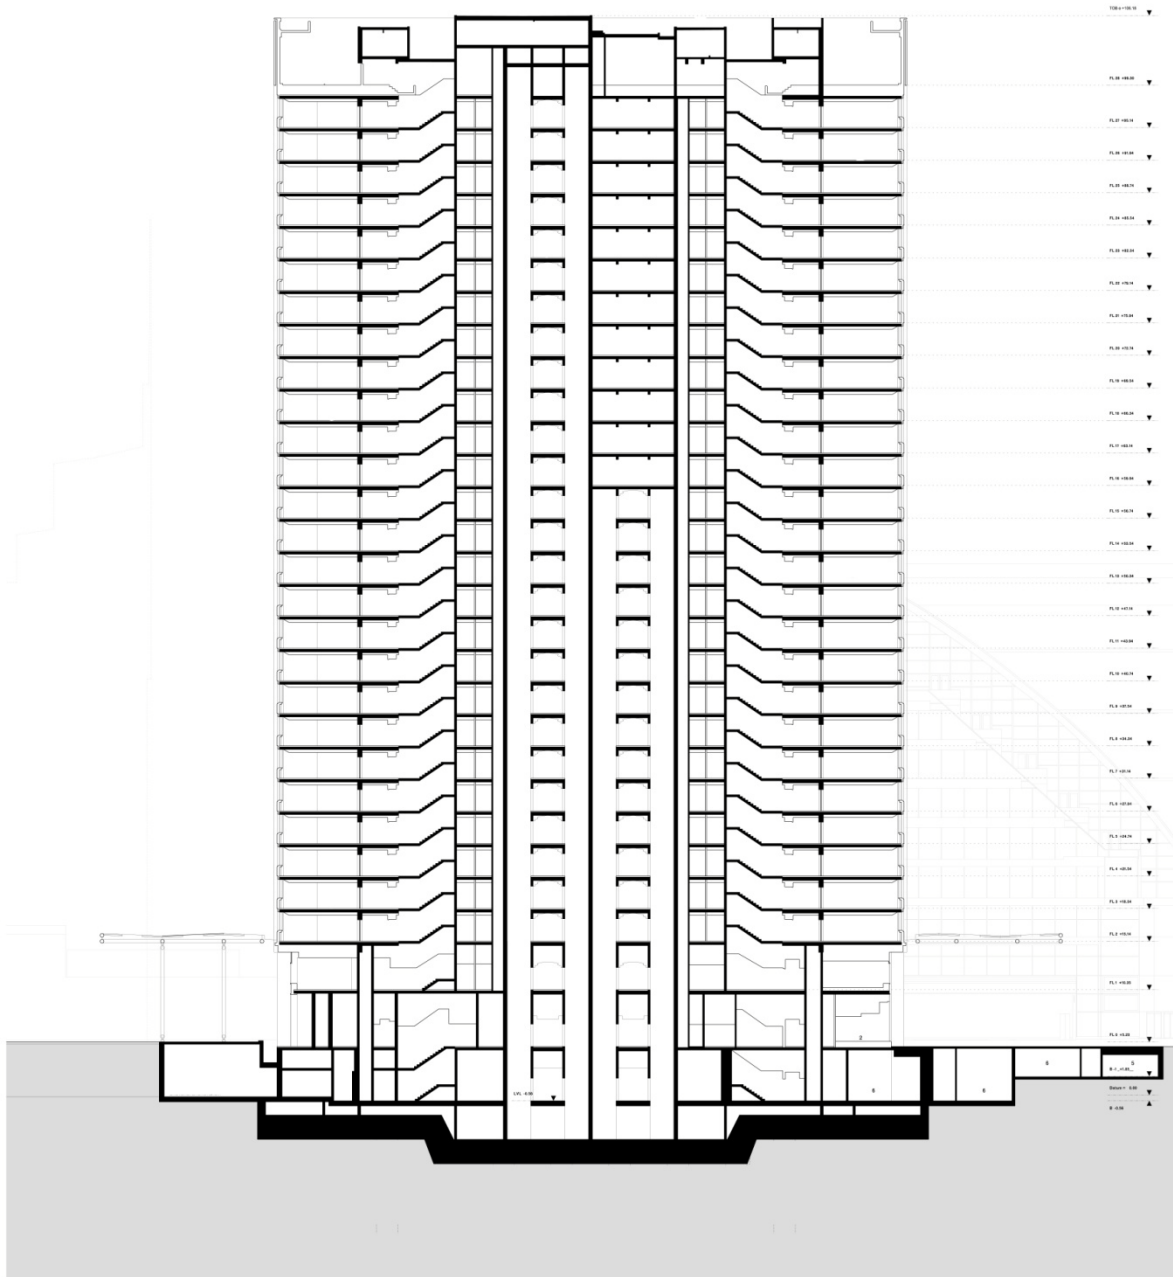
Portland House, Long Section, Existing (DCA, 2013)
